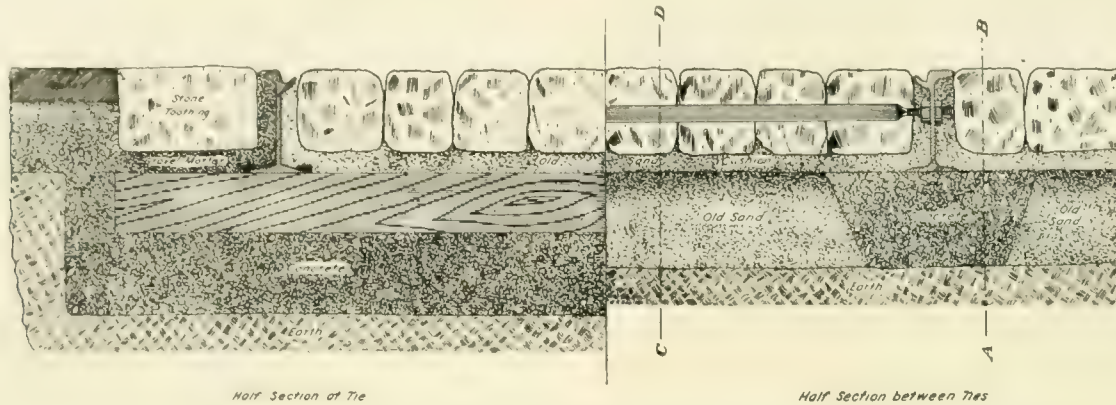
CROSS SECTION OF 9-IN. TRACK—BEAM CONSTRUCTION—COMMON STONE PAVING.
